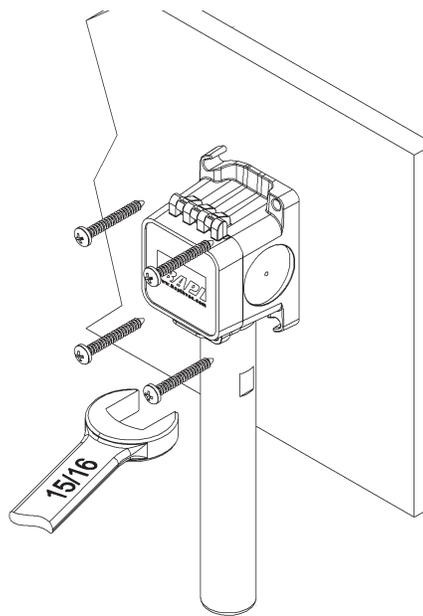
Thermobuffer in a BAPI-Box Crossover Installation
